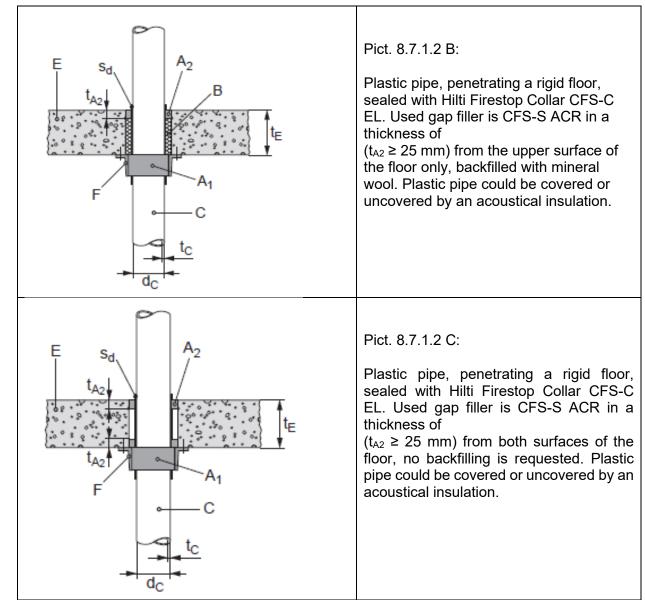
Gap seal with CFS-S ACR with/without backfilling around a plastic pipe, penetrating a floor
